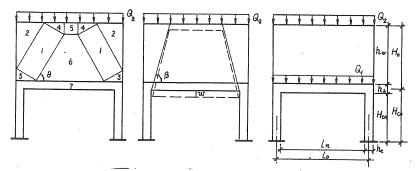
Divided parts Fig.9 Shear mecha- Fig.10 Calculated of walls-frame nism of walls-frame simplified diagram
